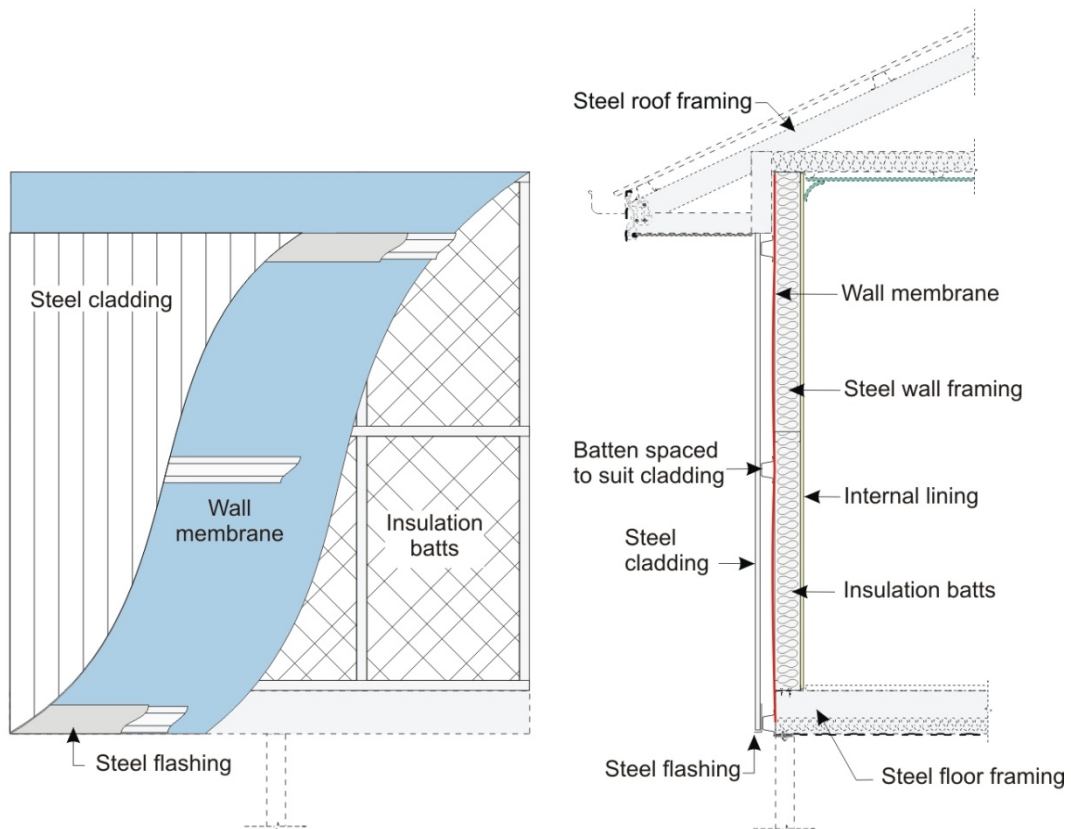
Typical steel clad wall details BAL-12.5, BAL-19, BAL-29 and BAL-40
